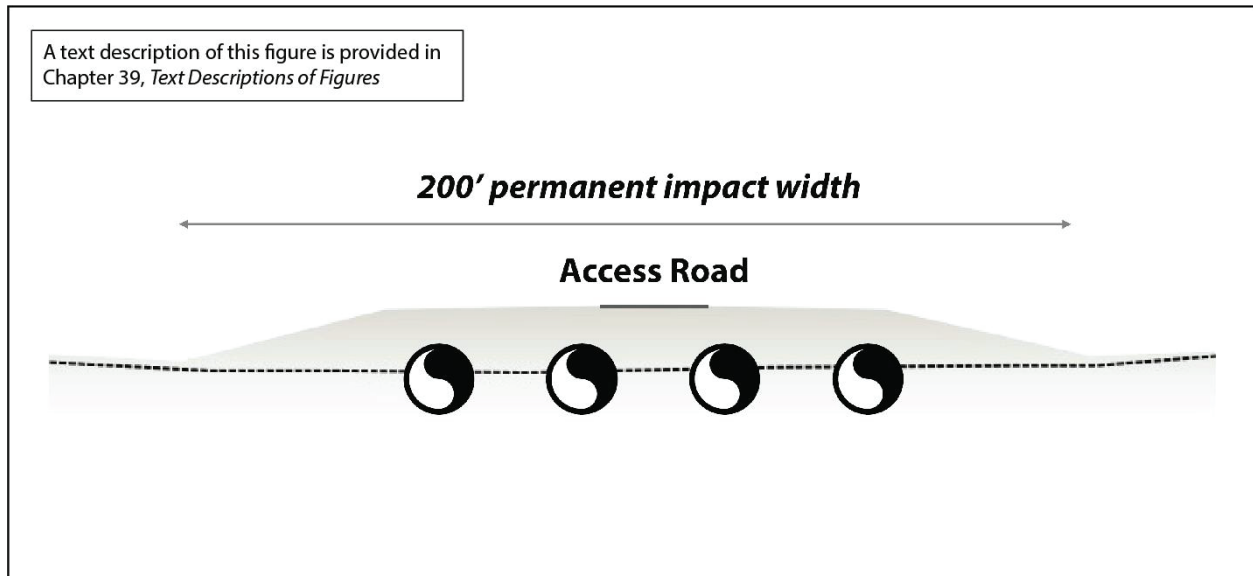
Typical Completed Section for Open Cut Reaches of Pipeline Alignment
